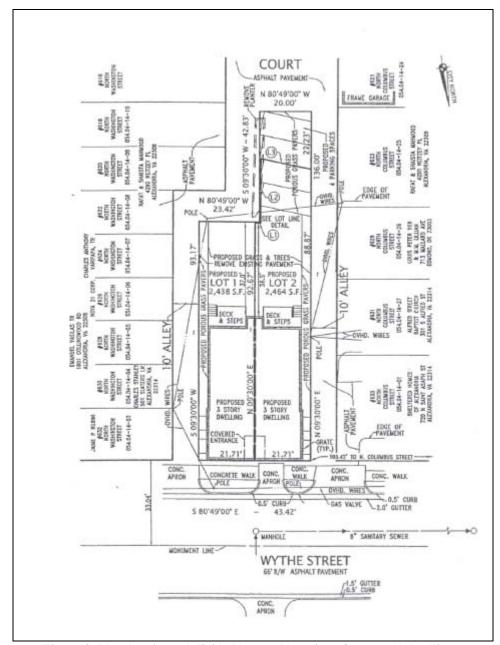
Plat showing subdivided lots and location of proposed dwellings.
